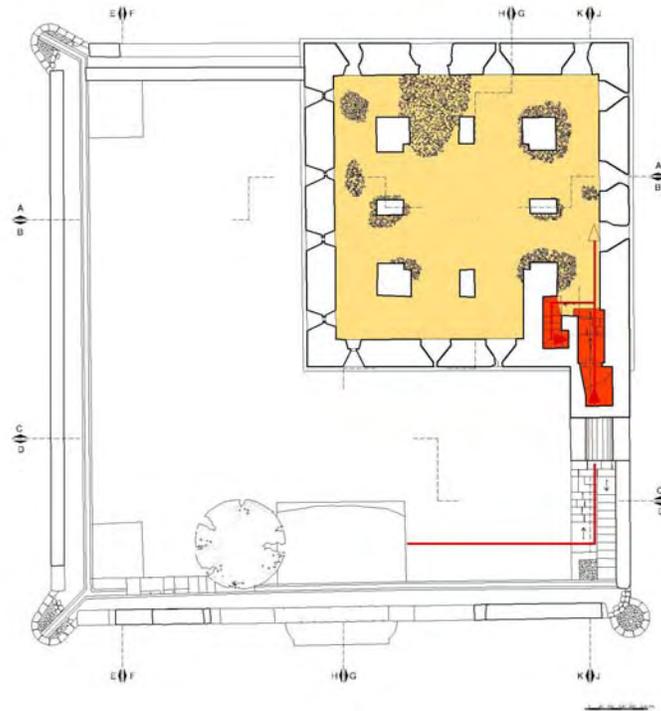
Types of Spaces and Circulation Layout- 1<sup>st</sup> Floor Plan.
